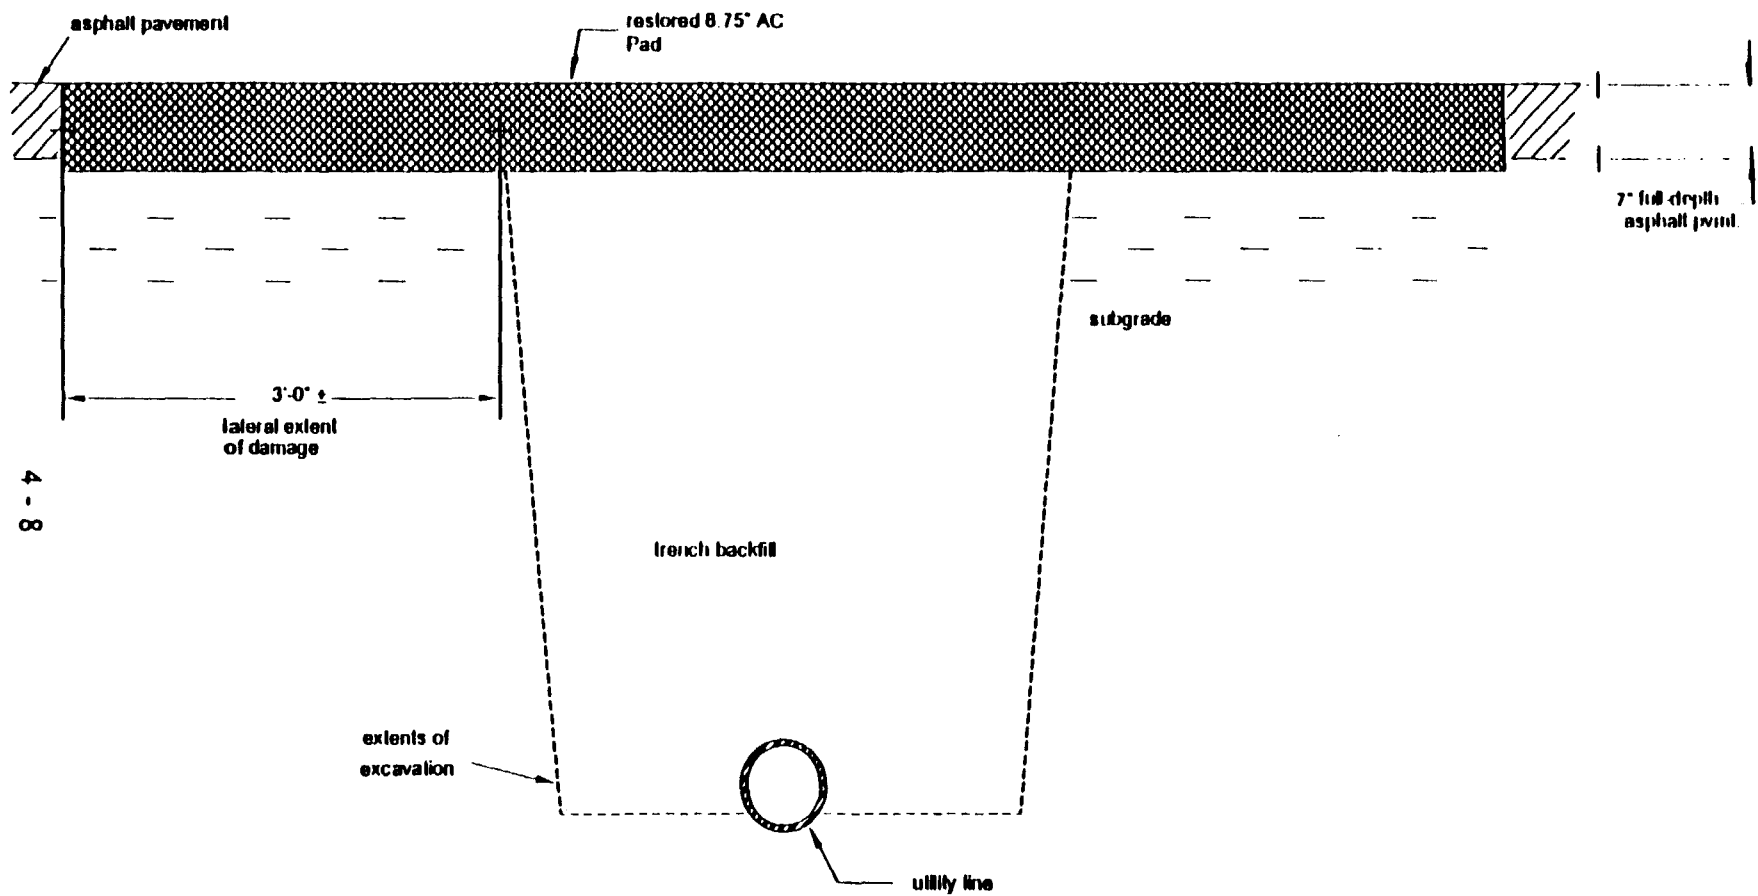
Pavement Strengthening by Replacing the 7 in. Thick AC Pavement with an 8.75 in. AC Pad - Scheme 3
